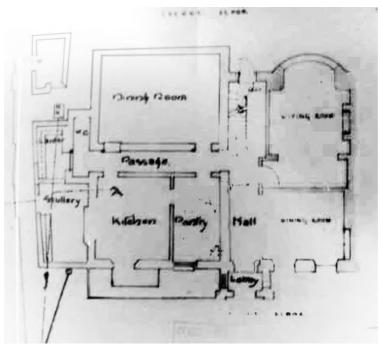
1913 Drainage Ground Floor Drainage Plan (Camden Archives)
